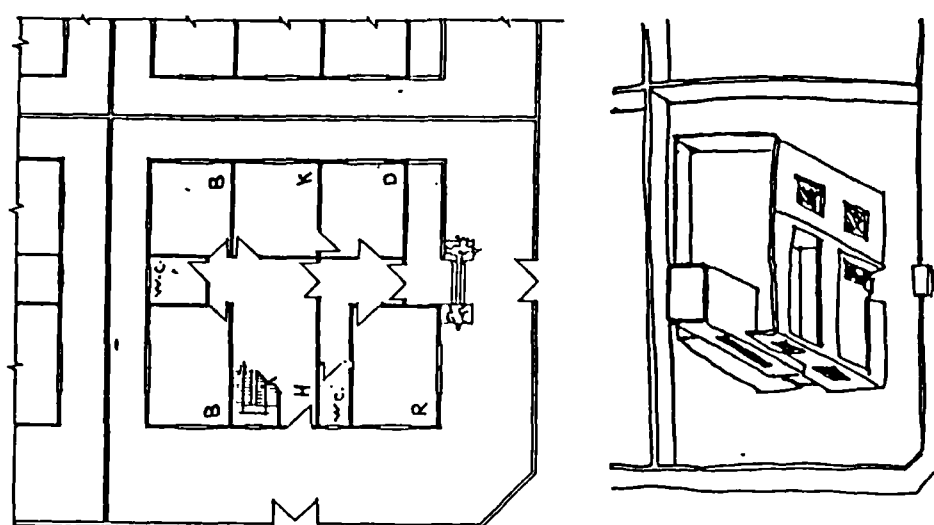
The new house type "Villa" with its reversed house orientation overlooking its adjoining neighbours' yards (after al-Hemaidi (1991)).
